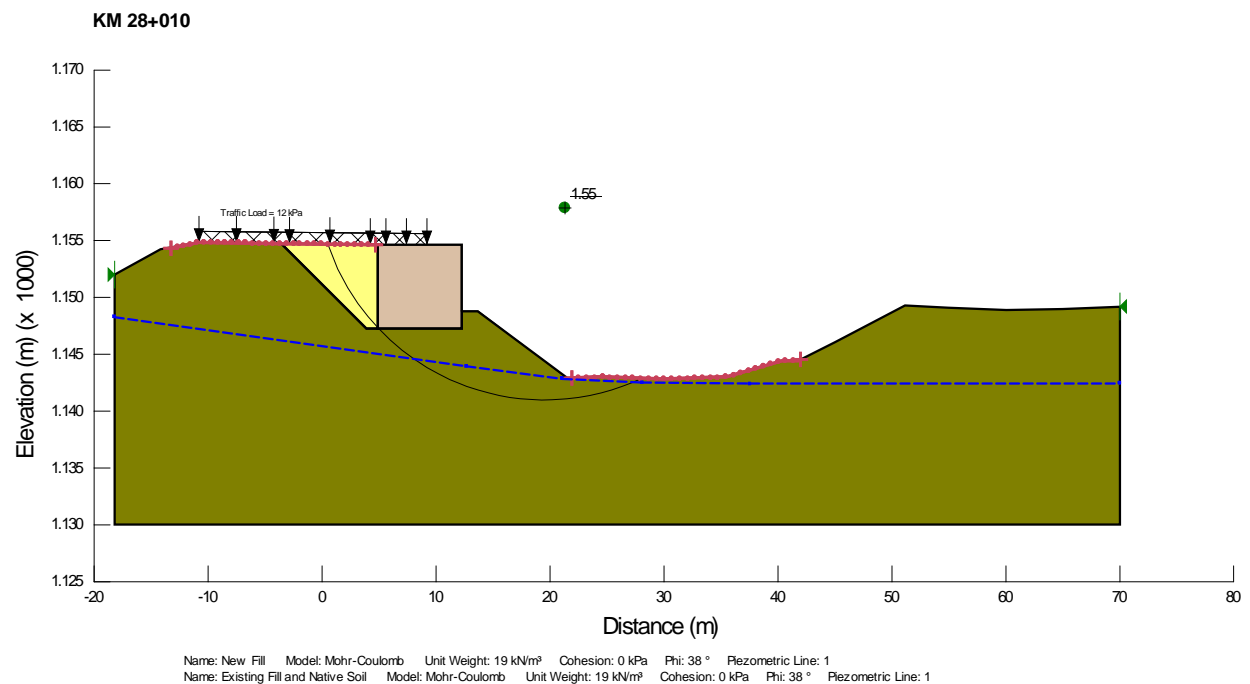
Station 28+010 - Global and Local Stability of the Slope after Construction of the Retaining Wall (Retaining Wall Height - 7.3 m, Wall Embedment below Finish Grade - 1.5 m, Reinforcement Length - 7.3 m)
